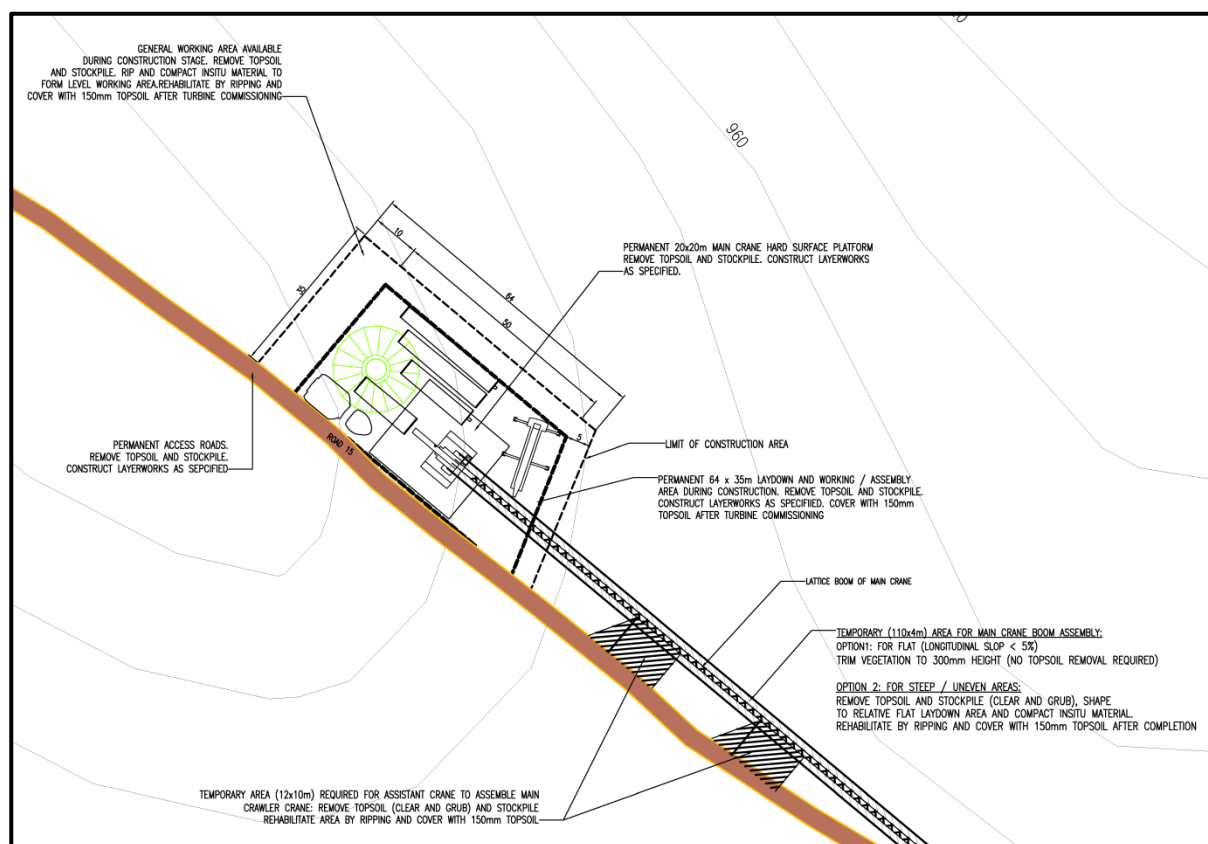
Sketch of wind turbine generator platform layout (see Appendix F for larger drawing) (Source: Africoast)
